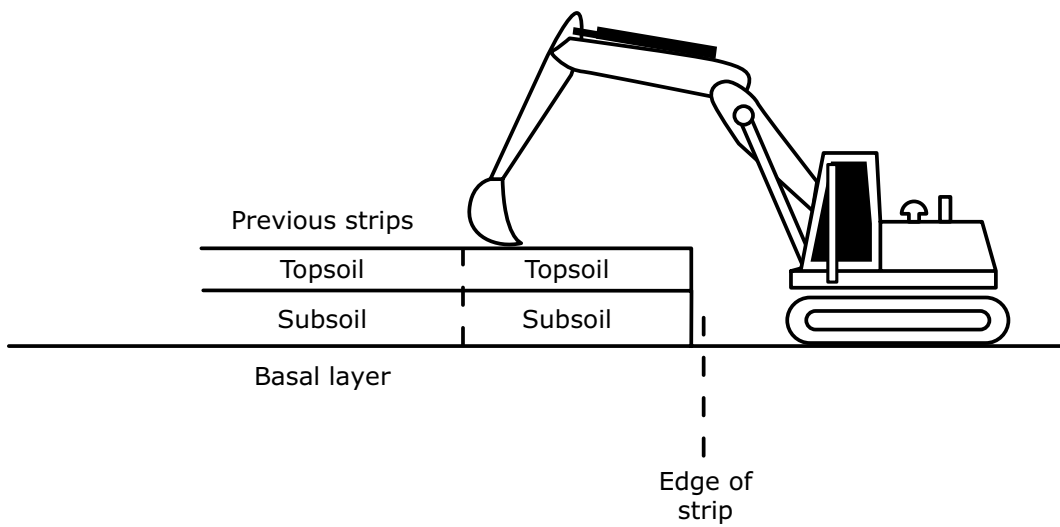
Soil replacement with excavators - dump trucks: Topsoil layer.
